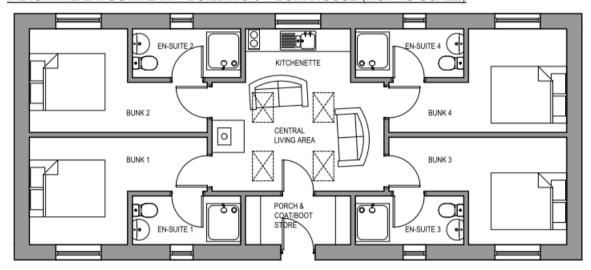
Plan showing indicative layout plan of Building 6 – Bunkhouse for illustrative purposes. Bowman Stewart. Not to scale
